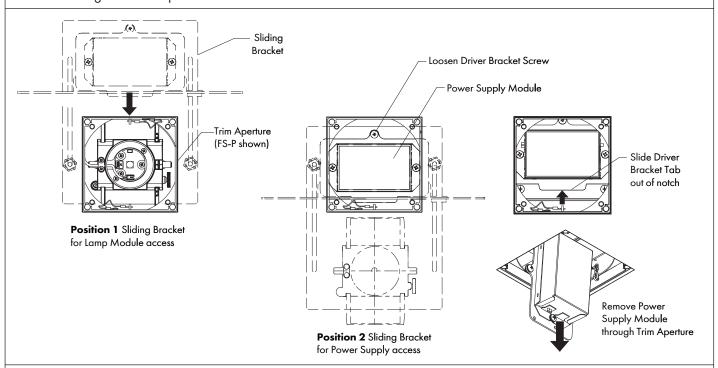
Sliding Bracket Positioning and Remove/Replace Power Supply Module
